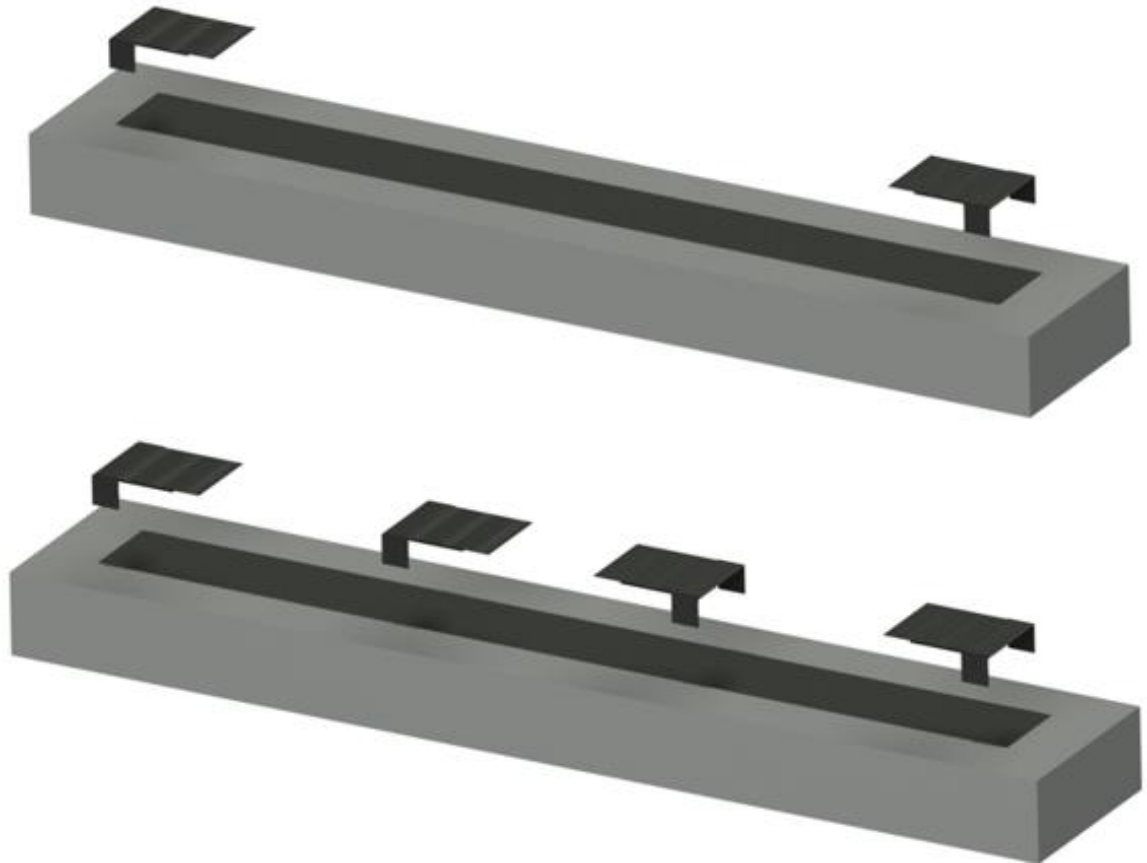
3D view of Concrete slab + CFRP Sheet + Flat Staple Anchor + CFRP Patch
